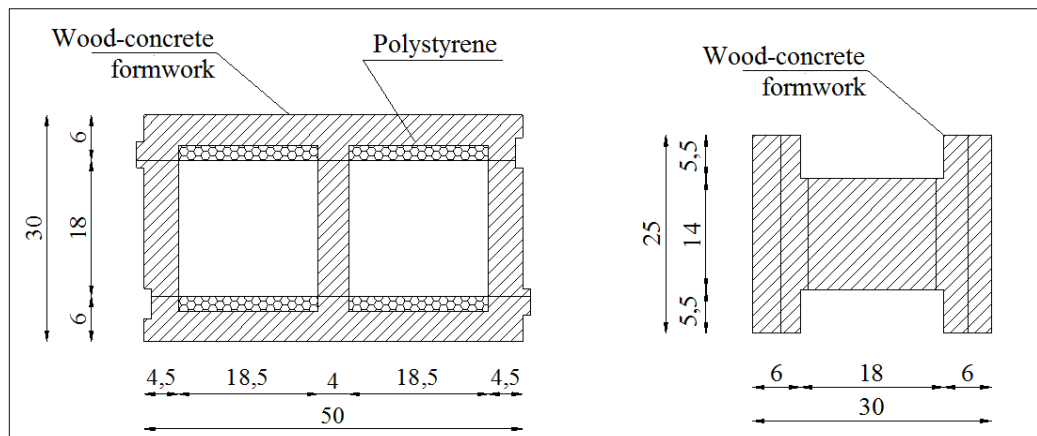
Scheme of formwork block of 30/22 used in the Lab. Tests
